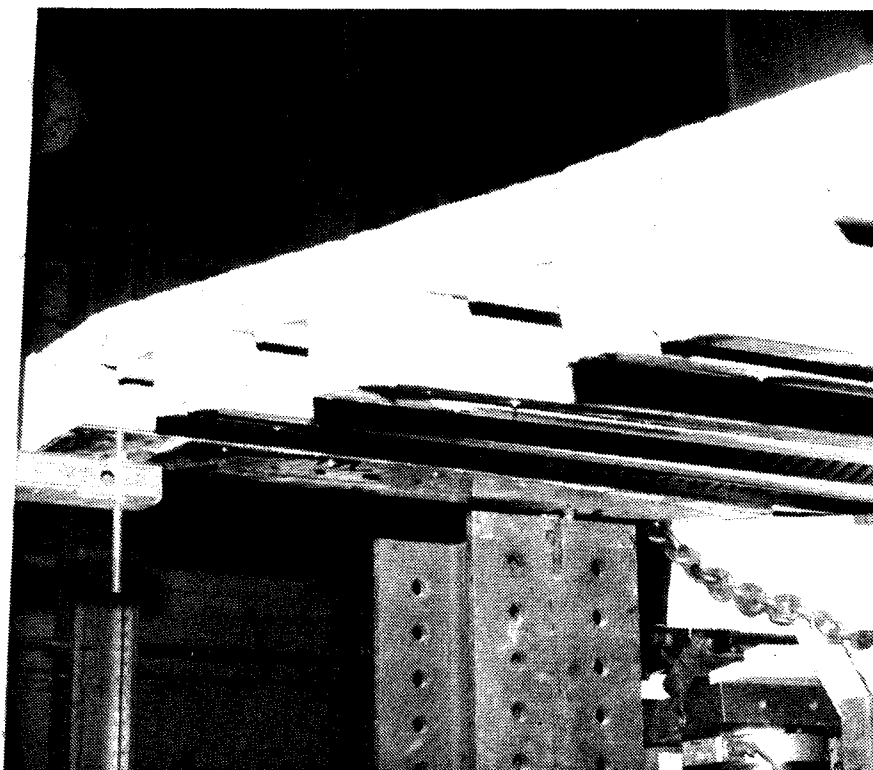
Change in slope of slab at north end due to transverse crack
